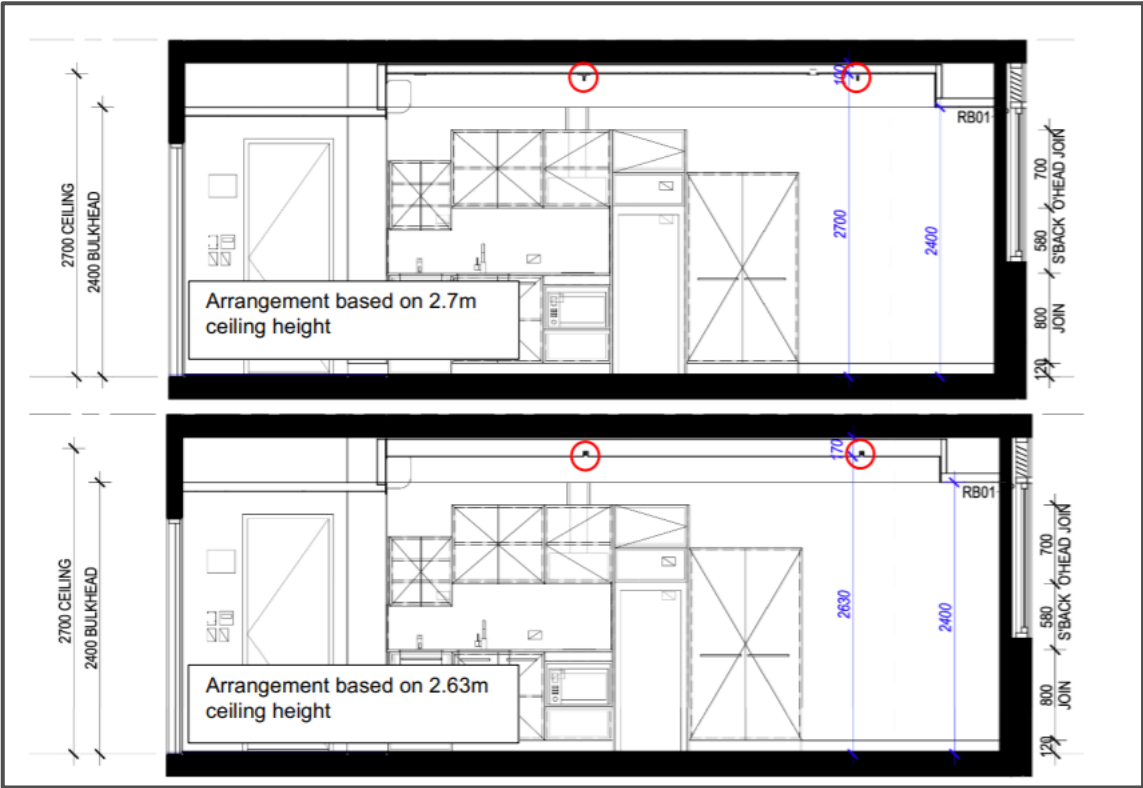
| Section through typical tower room for approved (top) and proposed (below). Sprinklers are circled in red. (Source: Applicant's RRTS).
